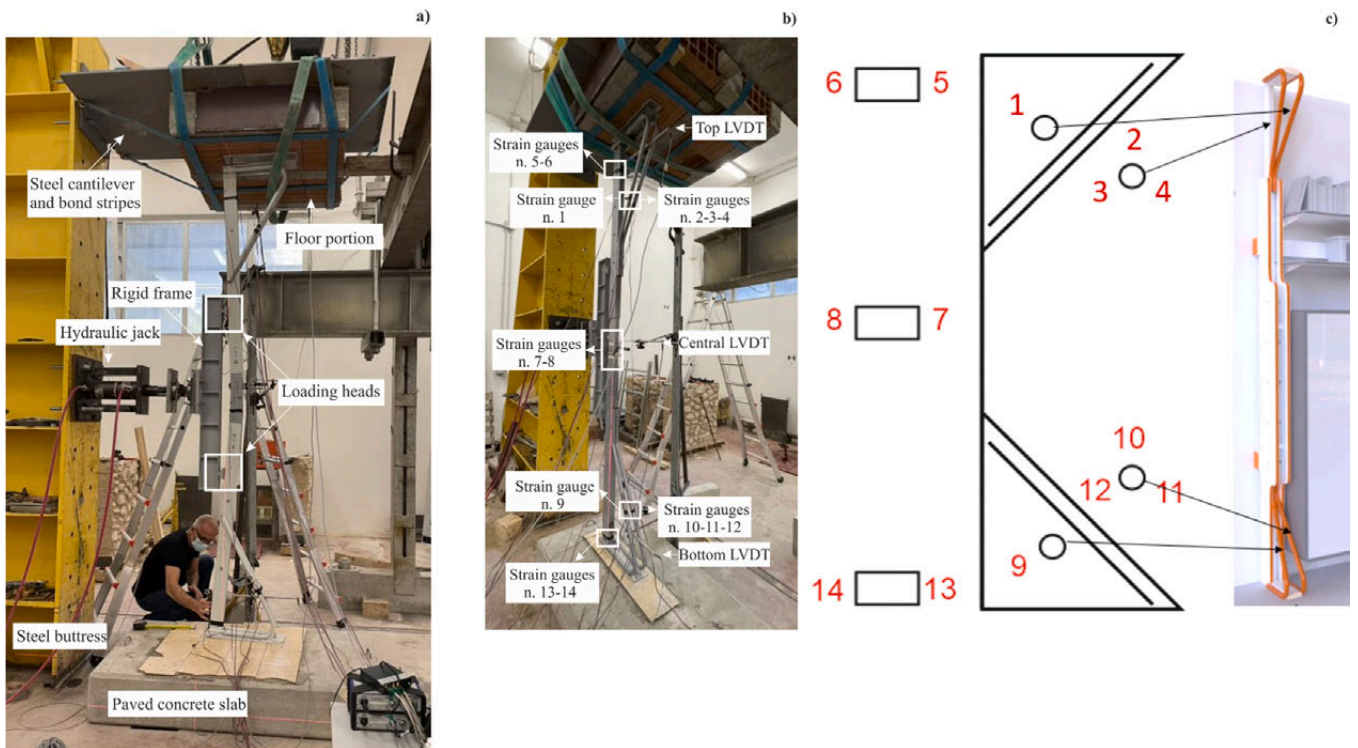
Static test performed on the LBDPs prototype: a) test setup; b) test instruments; c) strain gauge position.
